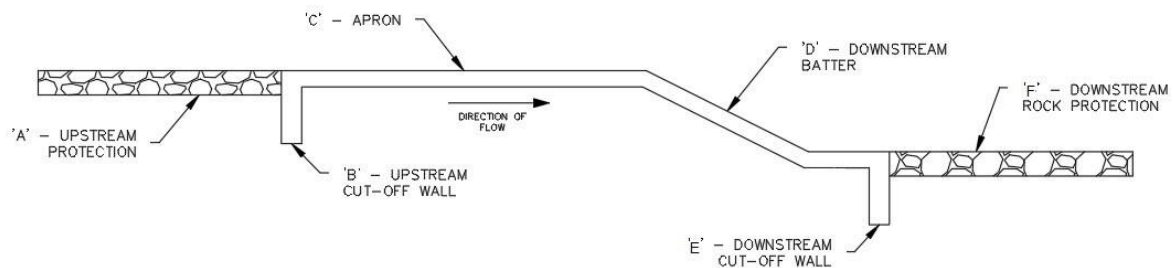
Components of a typical concrete floodway (Greene et al. 2020b)
